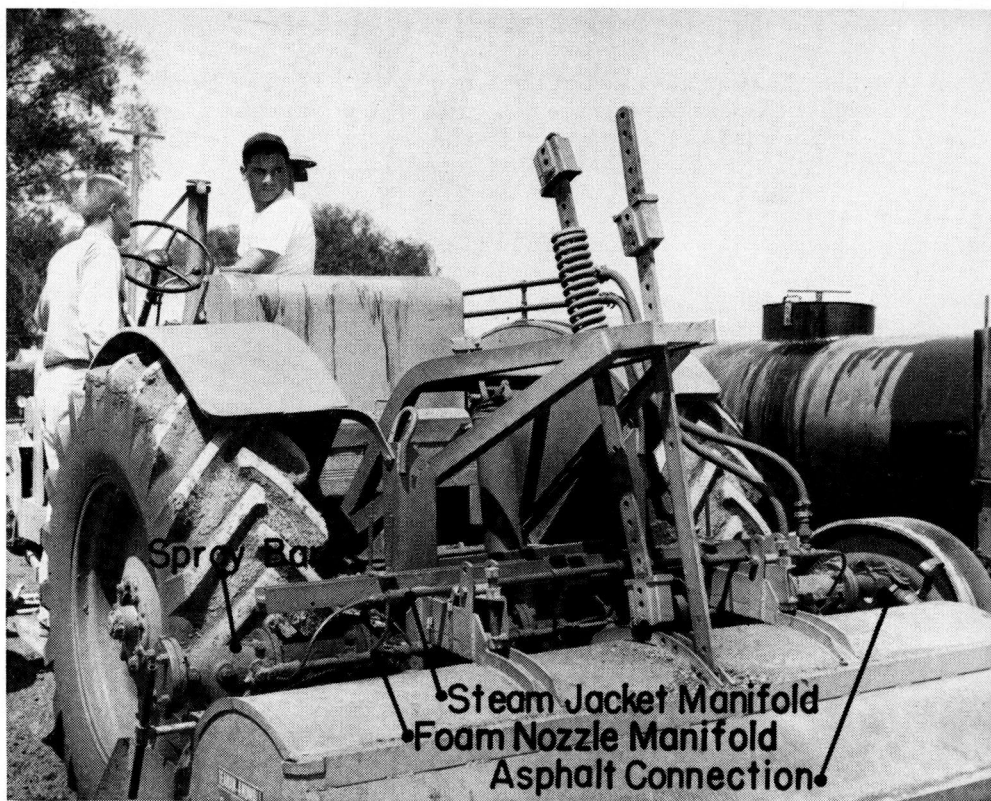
Foamed asphalt spray bar and steam and asphalt connections on mixer.
